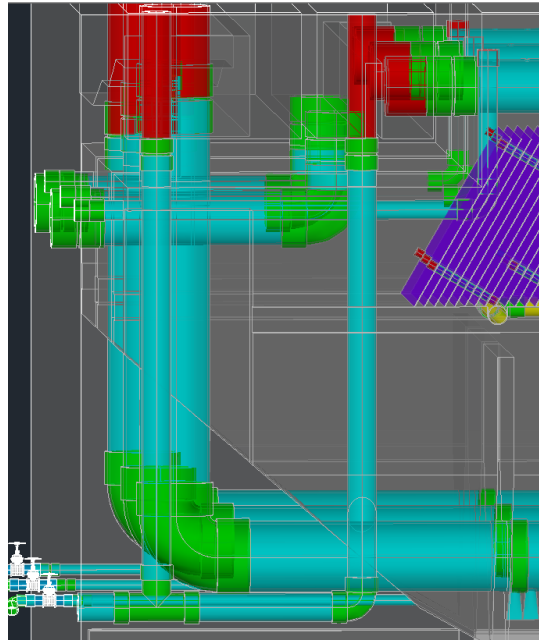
AutoCAD Drawing of the Sedimentation Tank Inlet and Exit Channel Drain System
